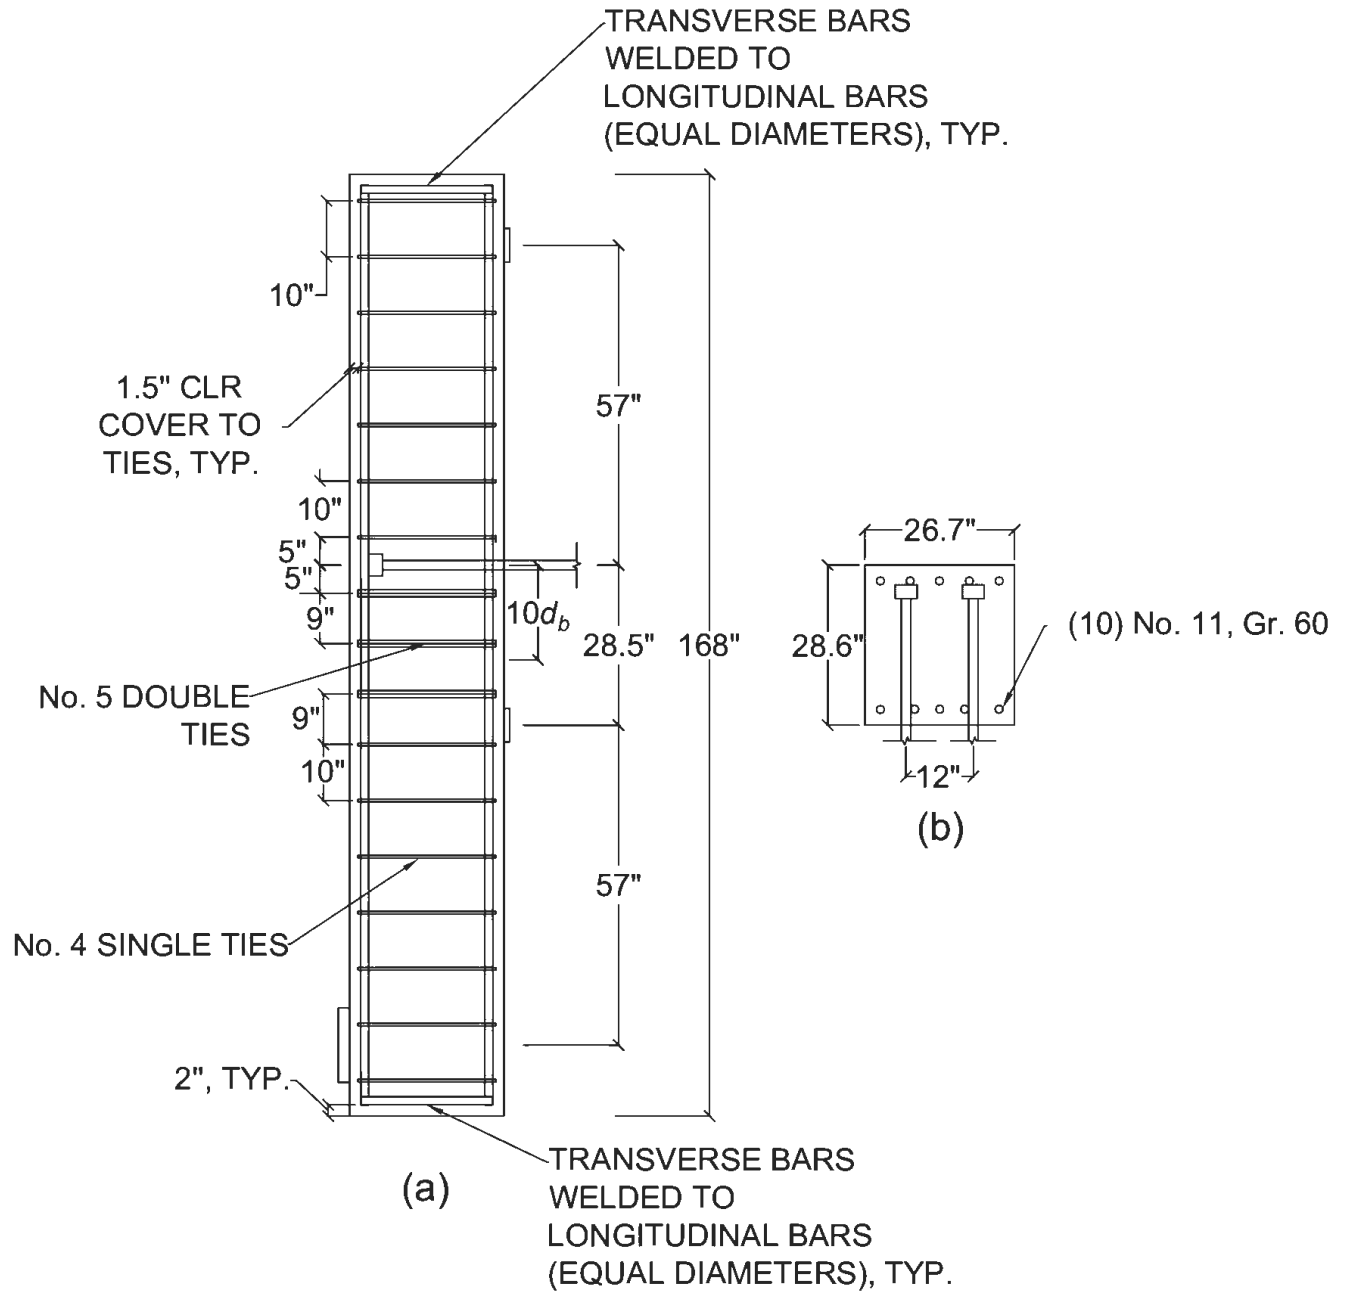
Details of reinforcement layout for No. 14 headed bar specimen 14-17: (a) elevation, (b) cross-section
